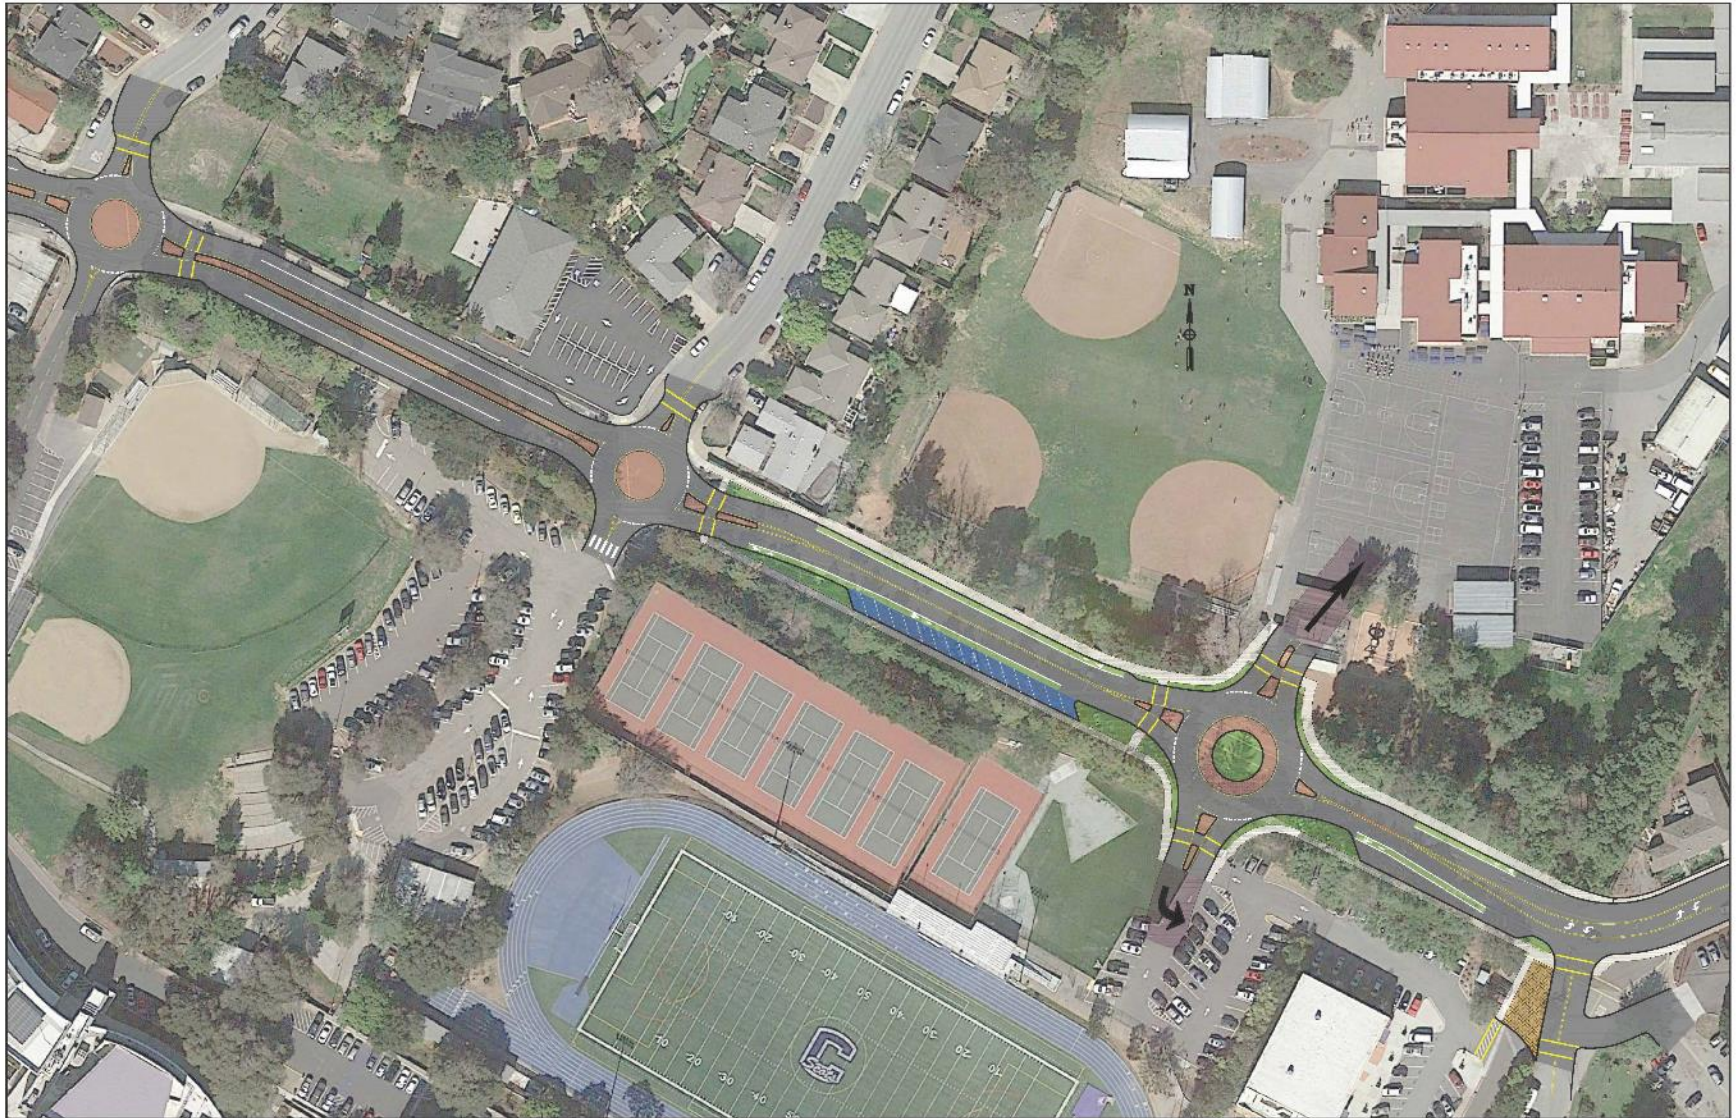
Alameda de las Pulgas/San Carlos Avenue Corridor Plan
